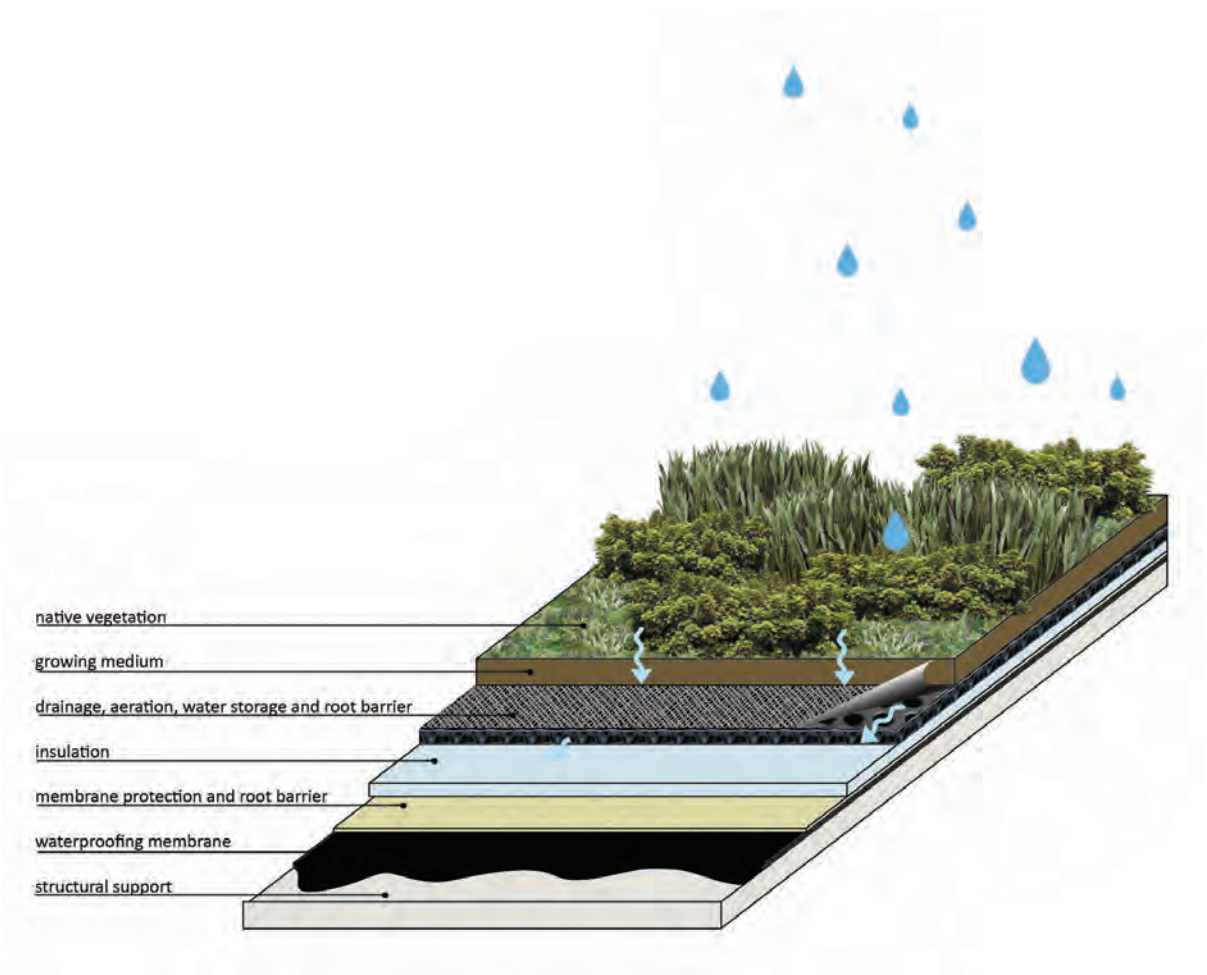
Typical Layers of a Green Roof Constructed as a Uniform Component
